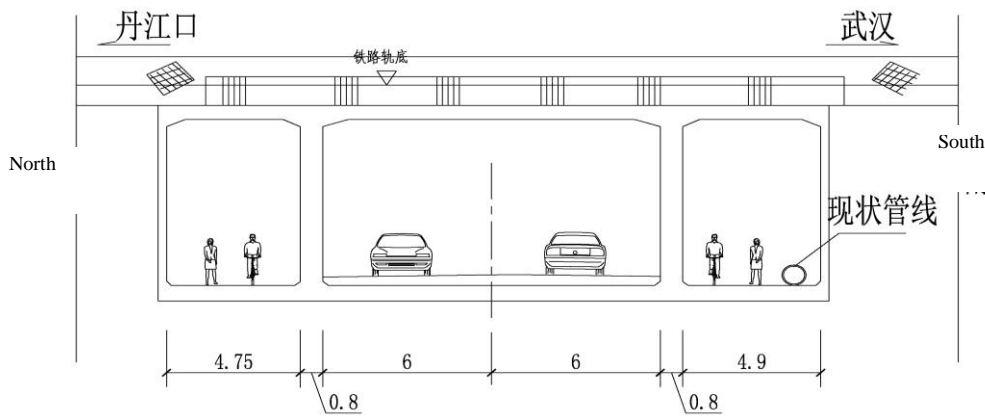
Existing Cross Section of Culvert in Handan Railway
